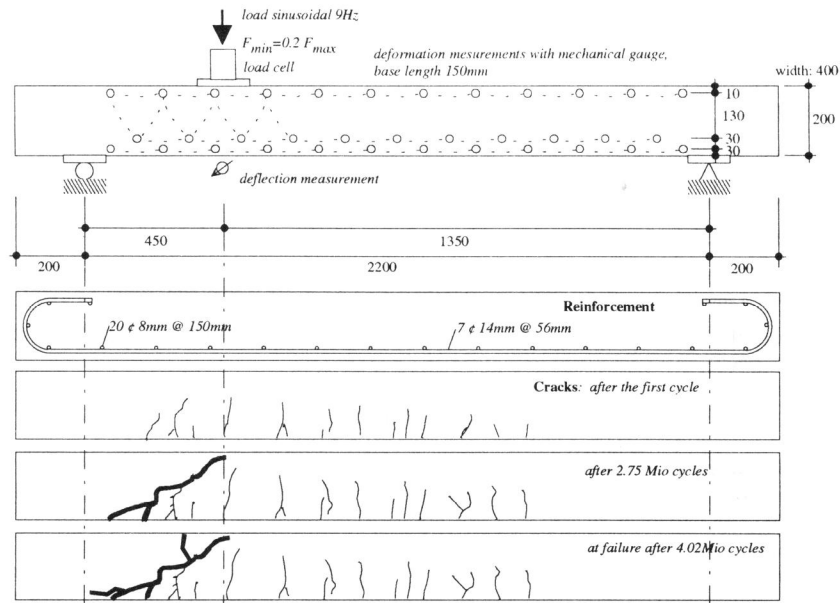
Specimen, test arrangement and typical crack patterns (all dimensions in mm)
